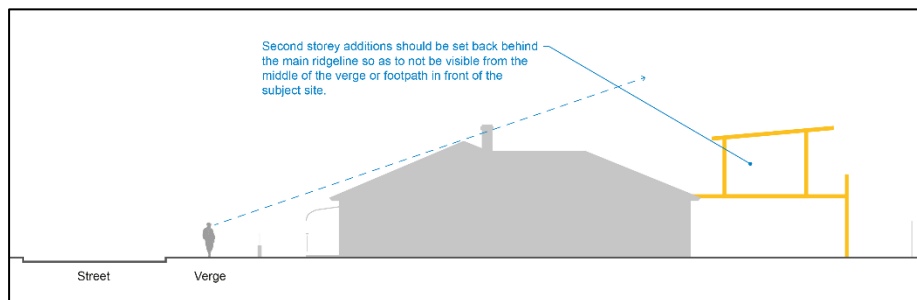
Flat and skillion roof forms, when used for additions to a single house can be less dominant than gabled roof forms.
